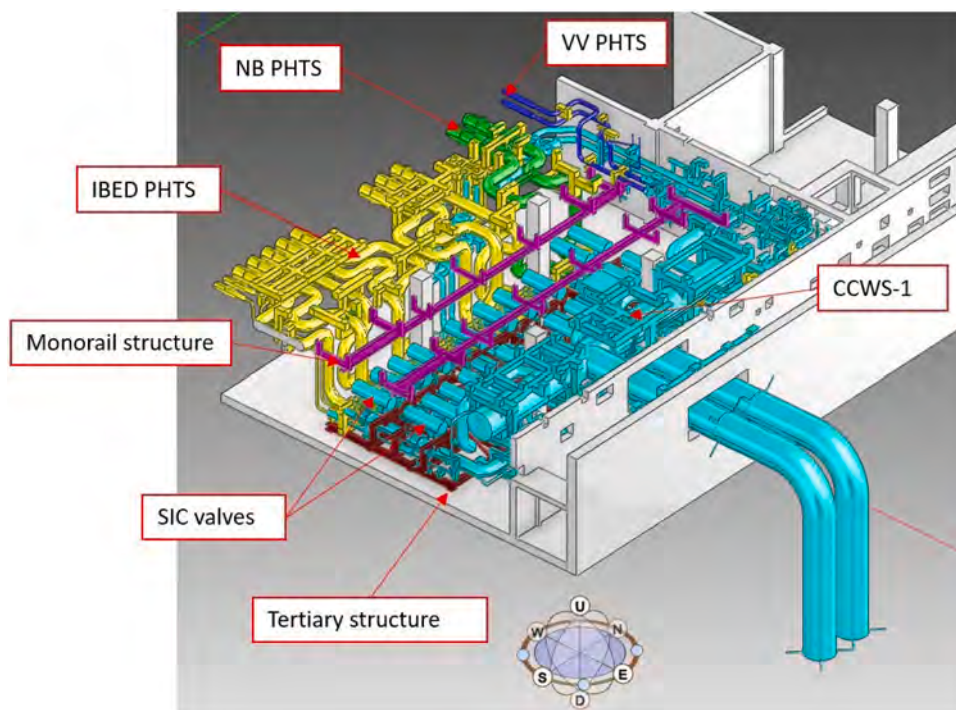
Portion of CCWS-1 pipe routing inside Tokamak Building.
